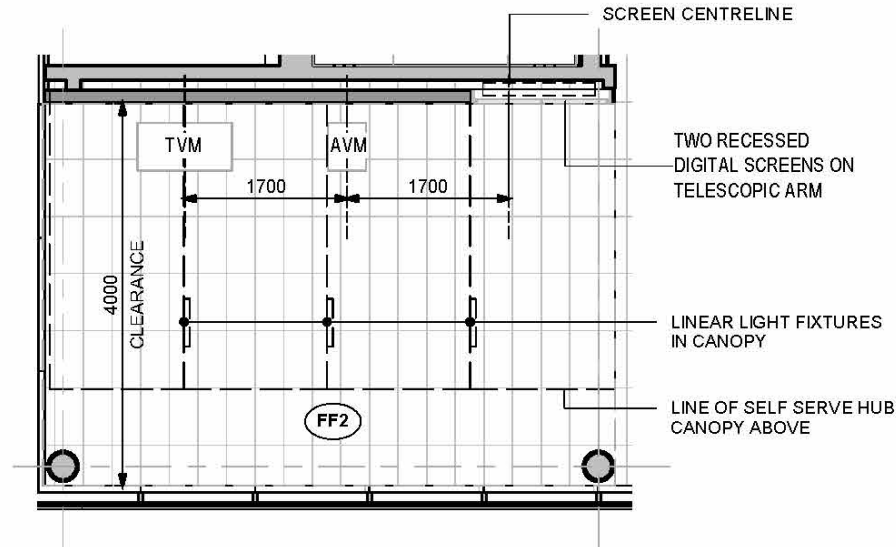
Plan of Self-serve Hub area (All dimensions are noted in mm).
